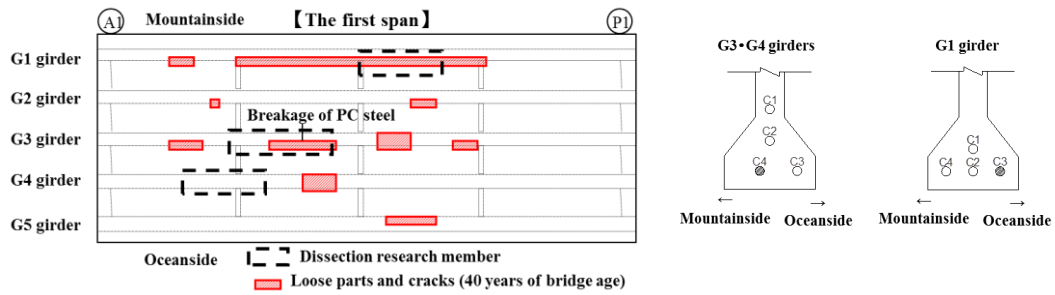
Damage condition of C bridge main girder bottom flange and member sampling location (left), and cable layout (right)
